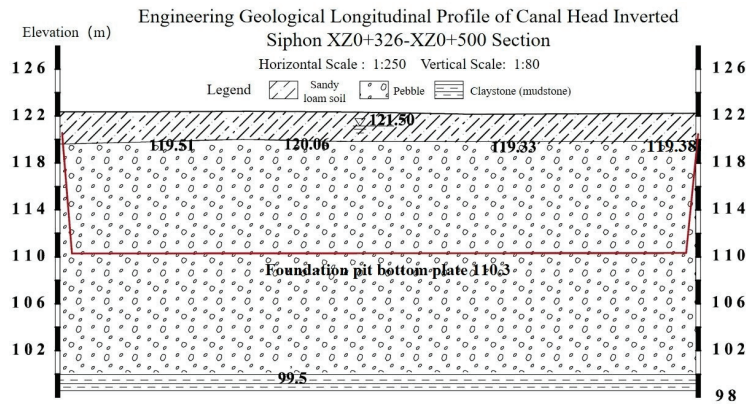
Engineering geological longitudinal section and foundation pit location of canal head inverted siphon section XZ0+326–XZ0+500.
